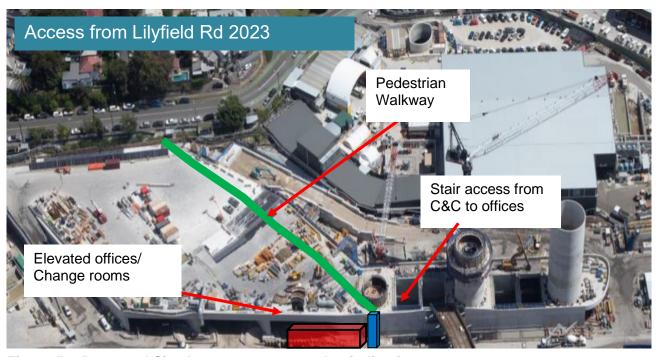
Proposed Site Access 2023 onwards - indicative
